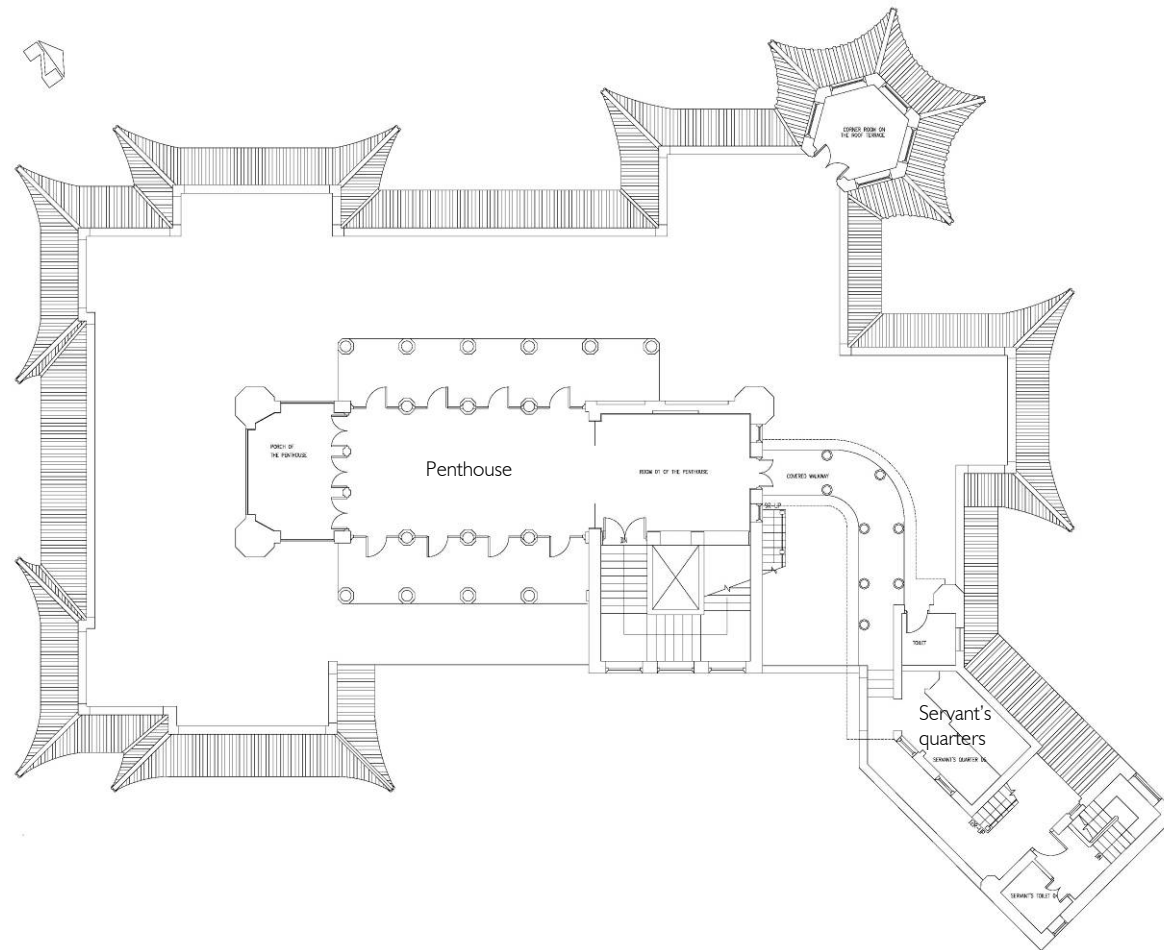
Existing Roof Terrace Floor Plan (1:250).
